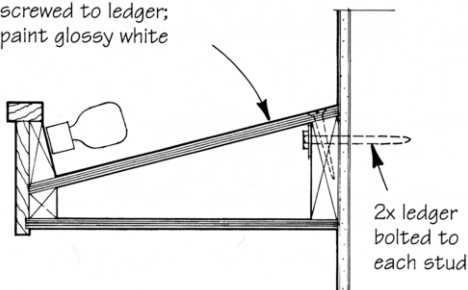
This cove light bracket is sturdy without relying on steel brackets or cantilevered supports.
